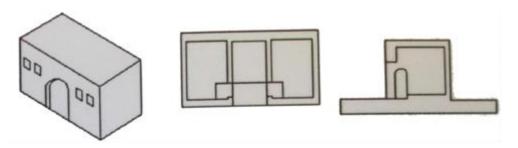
The formation of a rectangular building (Adeema, 2015)
